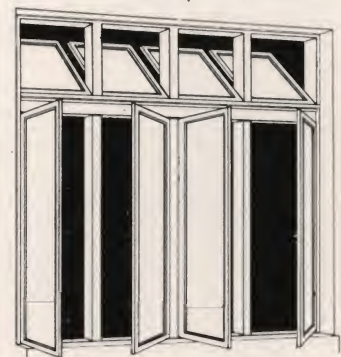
DETAIL OF WINDOW FRAME WITH HINGE AT BOTTOM
